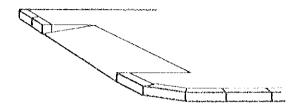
Layout of Improvement for Kerbstone on Sidewalk
